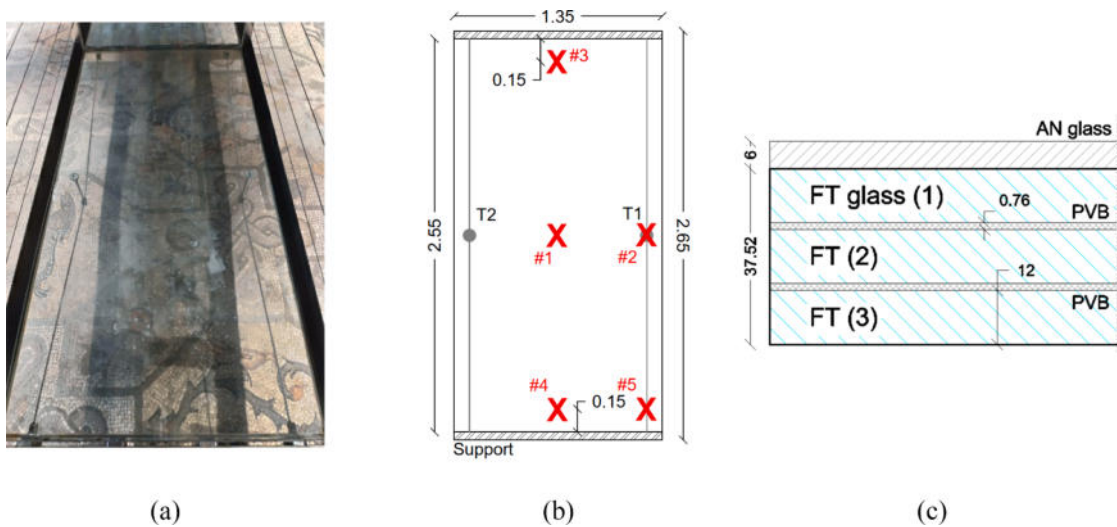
Case-study LG slab: (a) reference LGU module detail (Crypt of Excavations), with (b) nominal plan dimensions (values in m, with evidence of #n measurement points) and (c) cross-section layout (values in mm). Reproduced from [25] under the terms and conditions of CC-BY license agreement.
